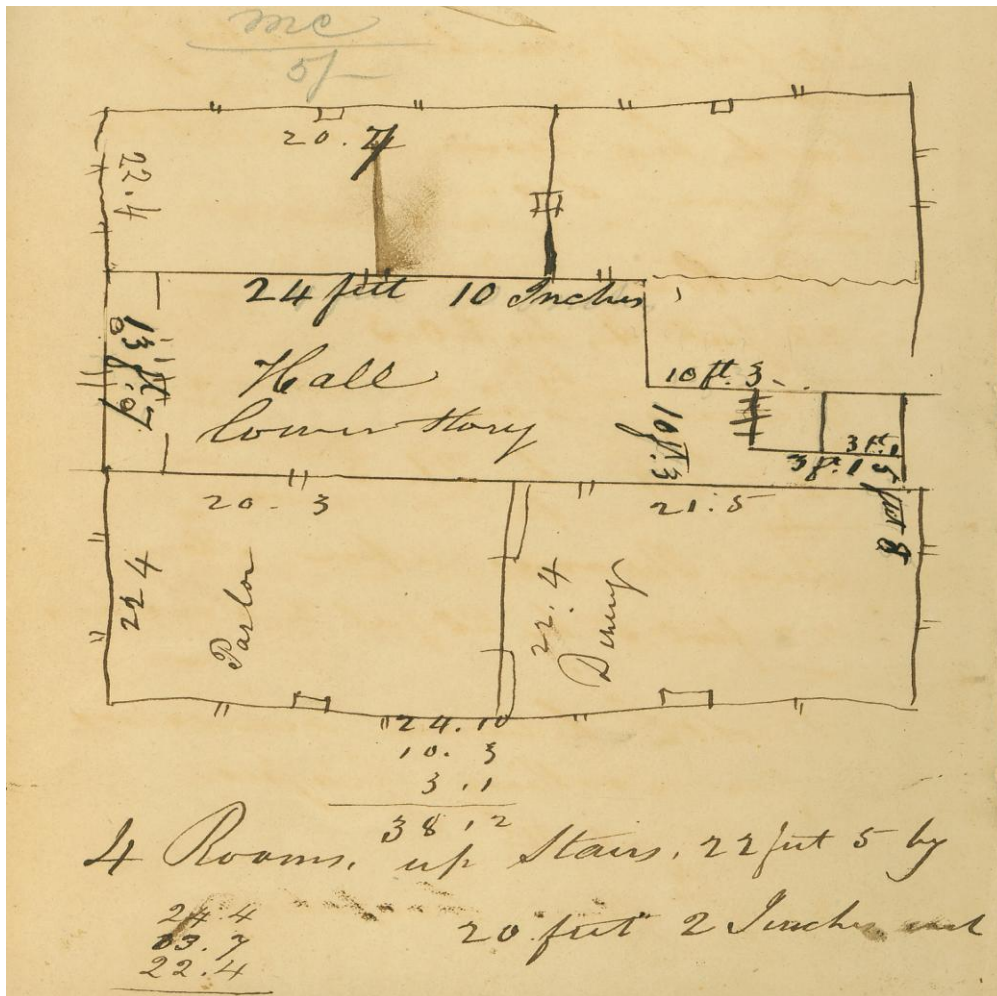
Rough sketch of Wakefield floorplan contained in Lewis Stirling's travel journal, circa 1836. Photo courtesy, private collection.
